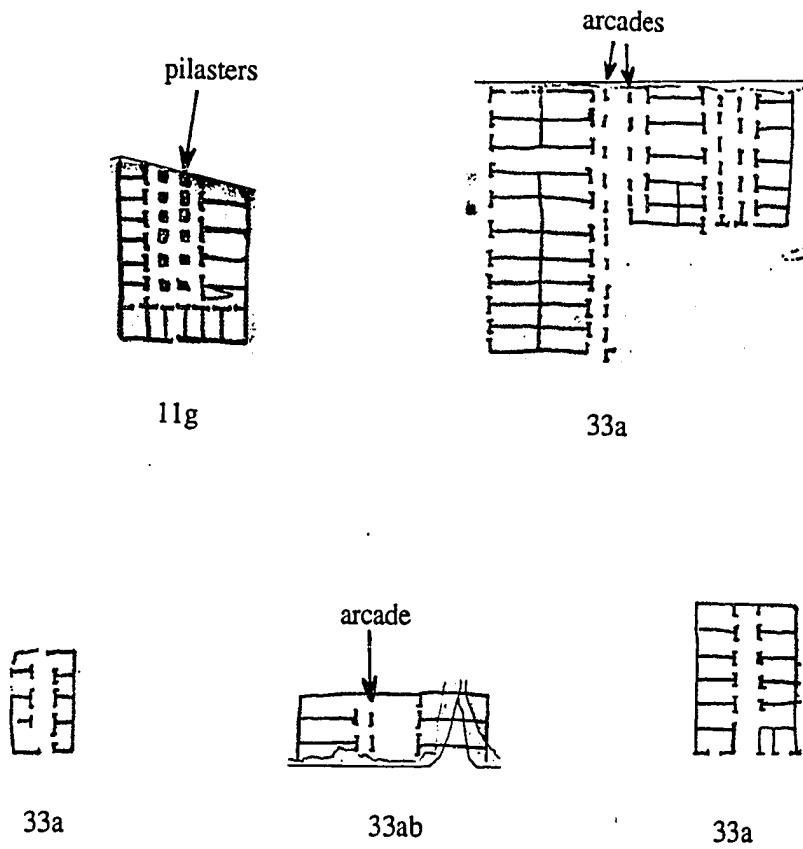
Corridor warehouses on the Marble Plan. (FUM)
